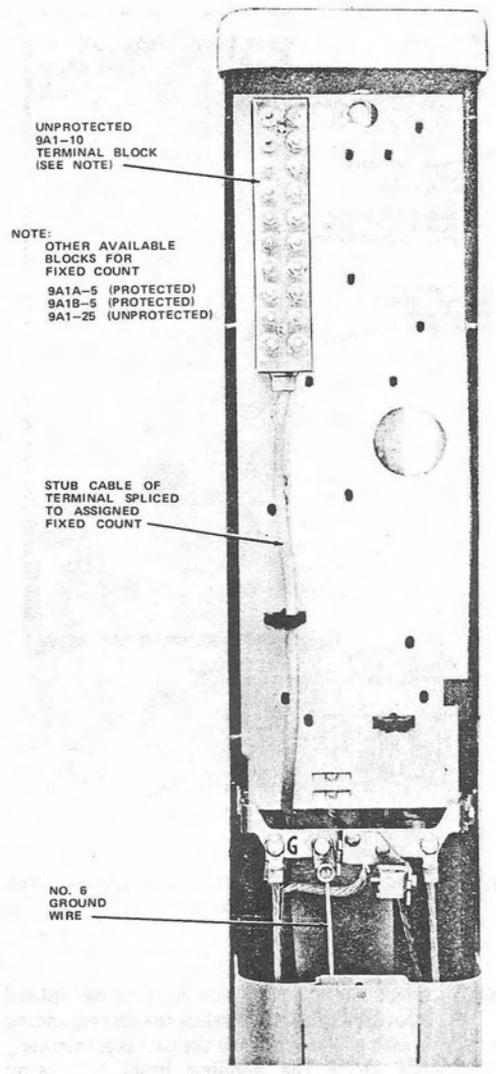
PC6/48 Cable Closure Equipped With 9A-Type Terminal Block
